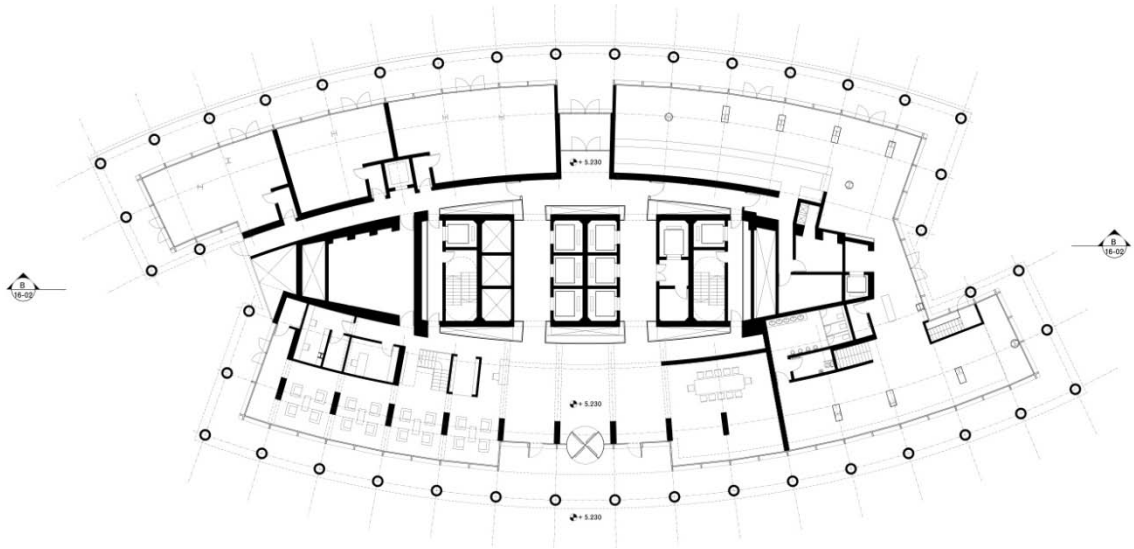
Portland House, Ground Floor Plan, Proposal (DCA, 2013)
